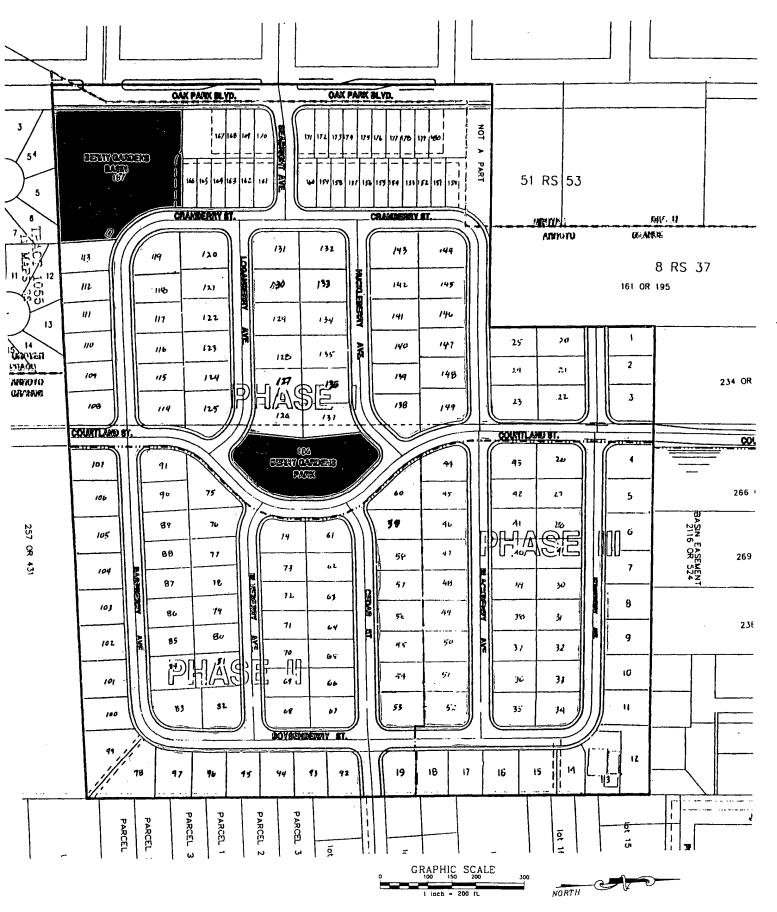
BERRY GARDENS SPECIFIC PLAN - Subarea 1.
